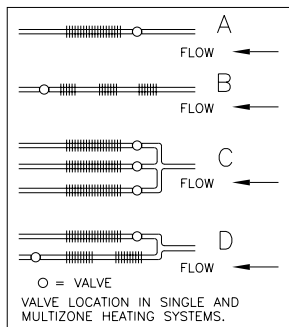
Valve Location in Single and Multizone Hot Water Heating
